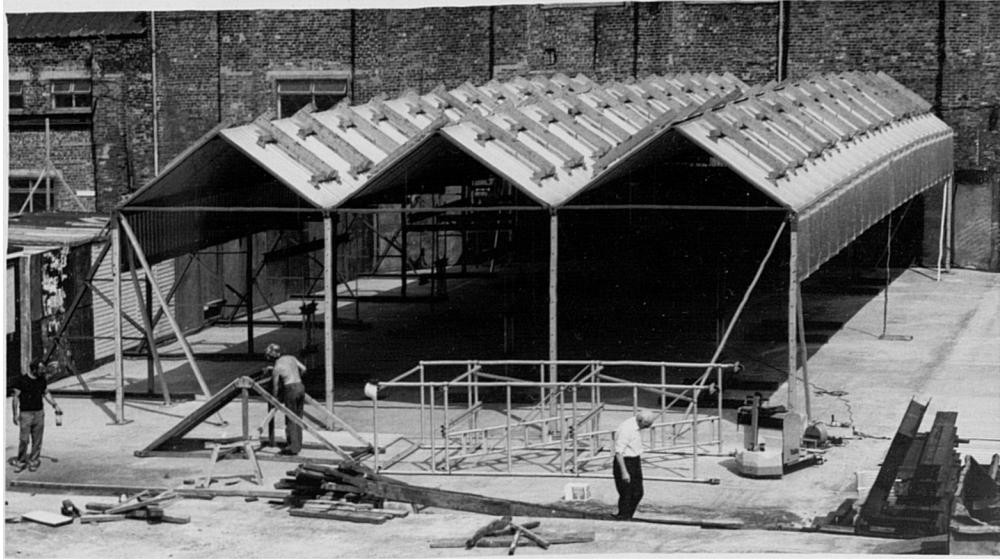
Roof ready for testing with side sheeting and loading system attached
